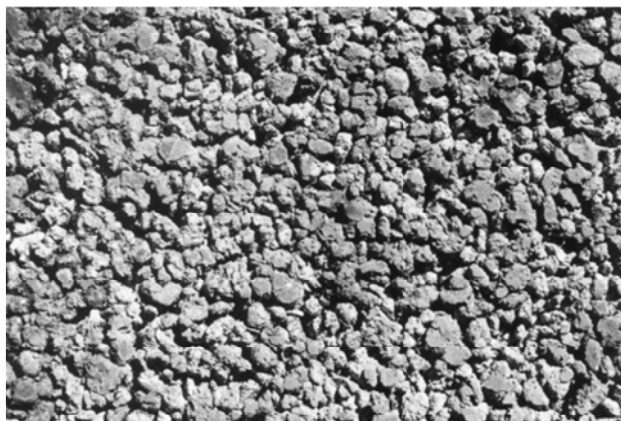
Pervious concrete pavement texture on parking lot.
